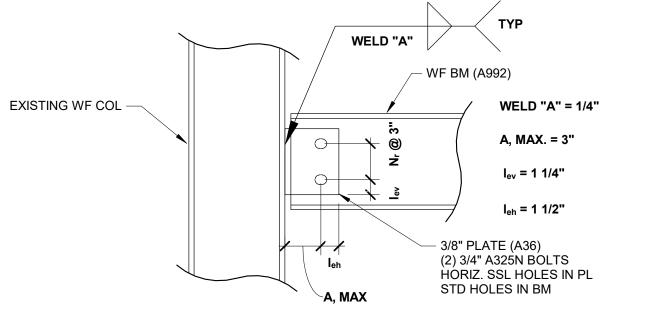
Detail TYP SHEAR CONNECTION 1 1/2" = 1'-0"
